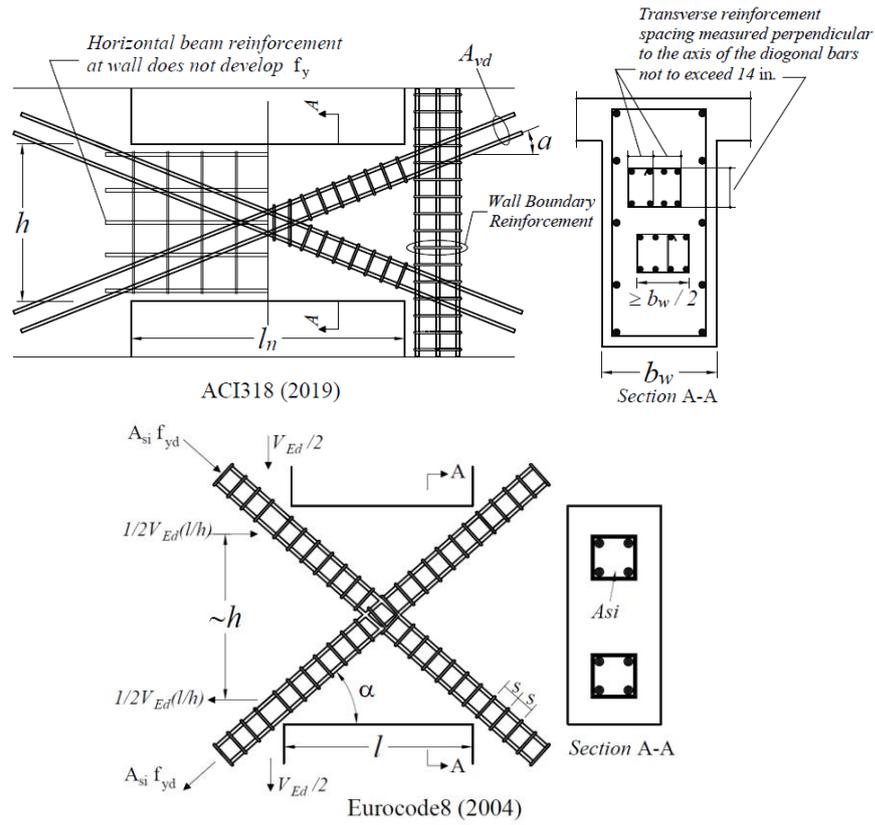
Reinforcement configuration of diagonally confined special reinforcement in coupling beams
